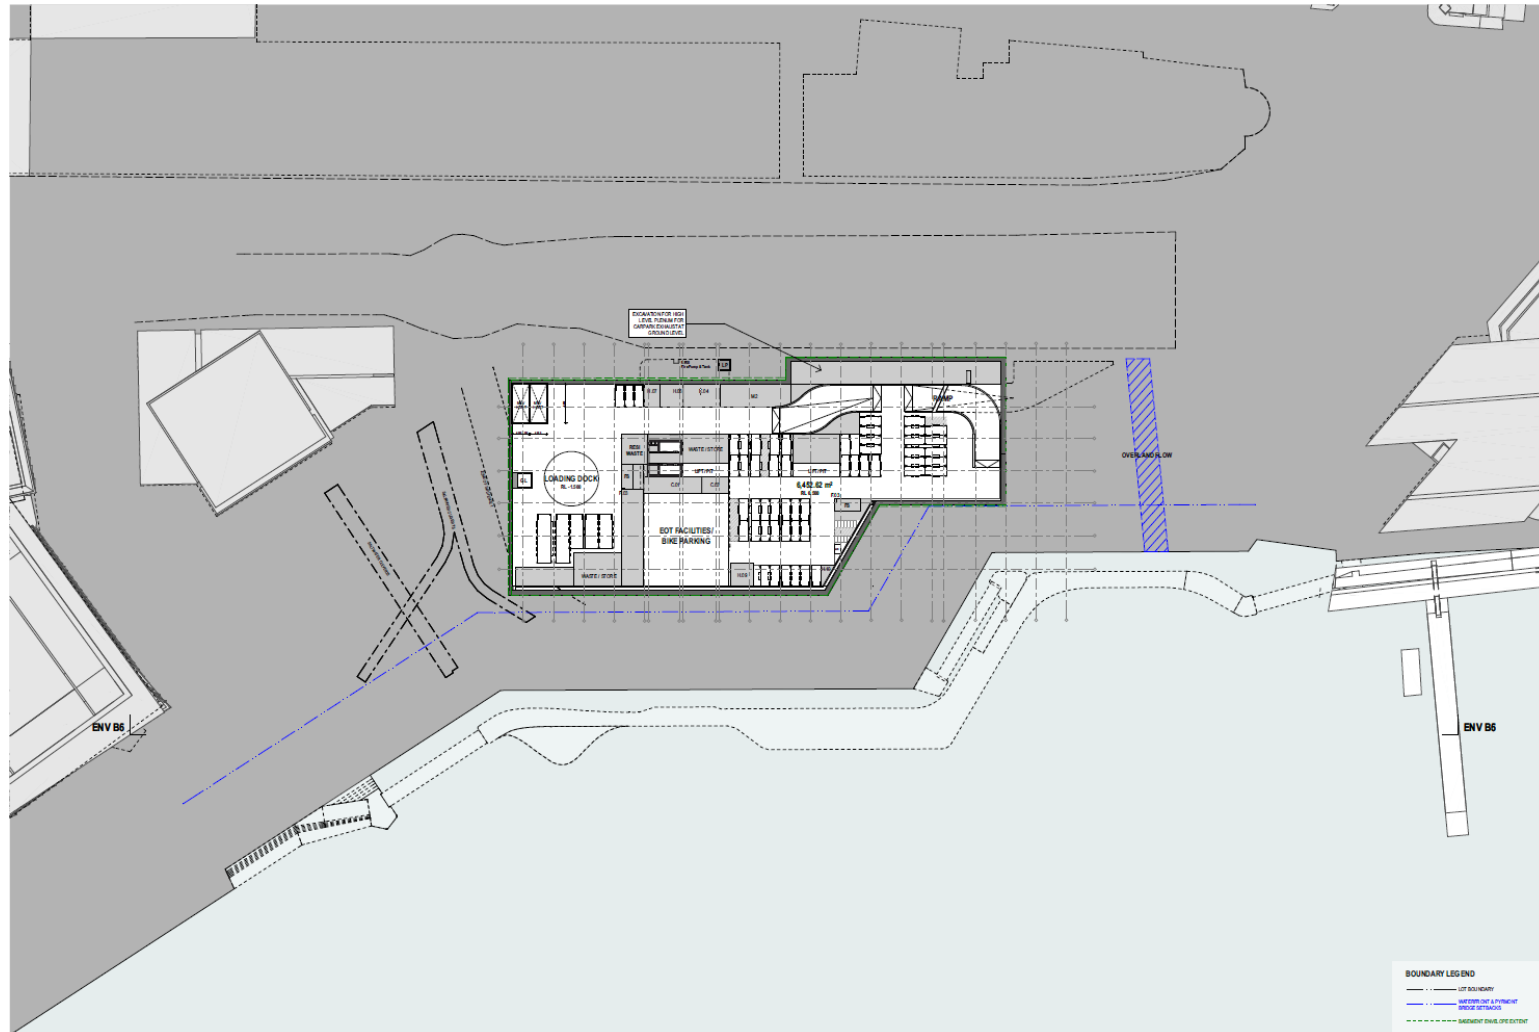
Basement 1 – Indicative Plan Only (Source: FJMT, 2020)
